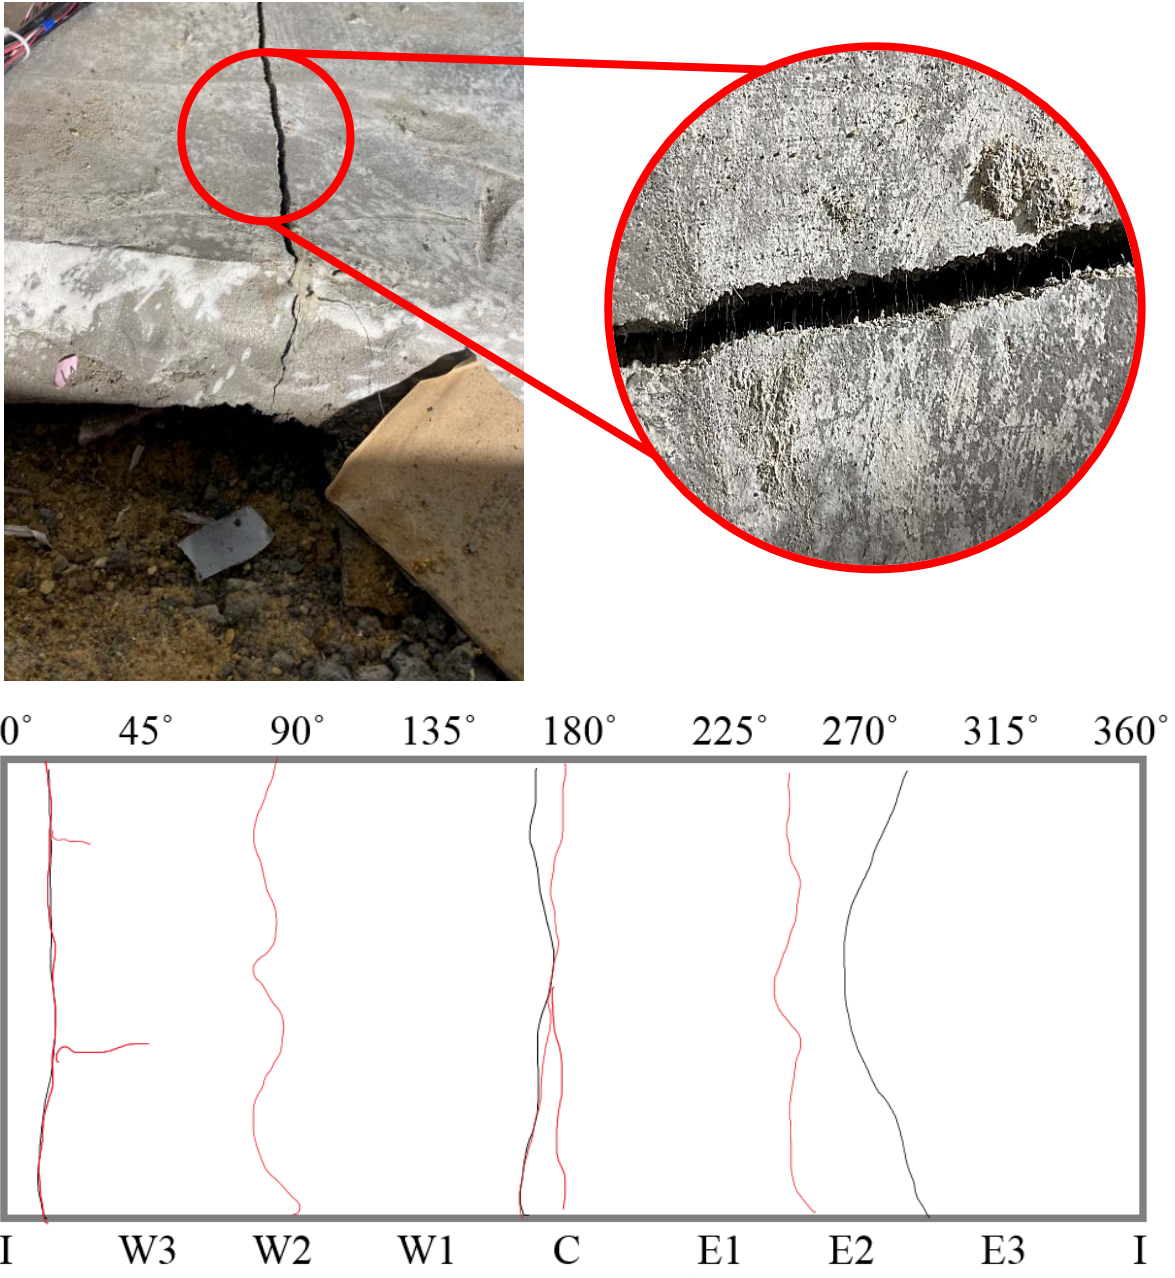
Visual inspection of the 1-in. thick SAPL renewed pipe arch CMP: (top) cracked SAPL on the invert, and (bottom) crack pattern schematic, where black represents the shrinkage cracks and red represents the cracks due to the load.
